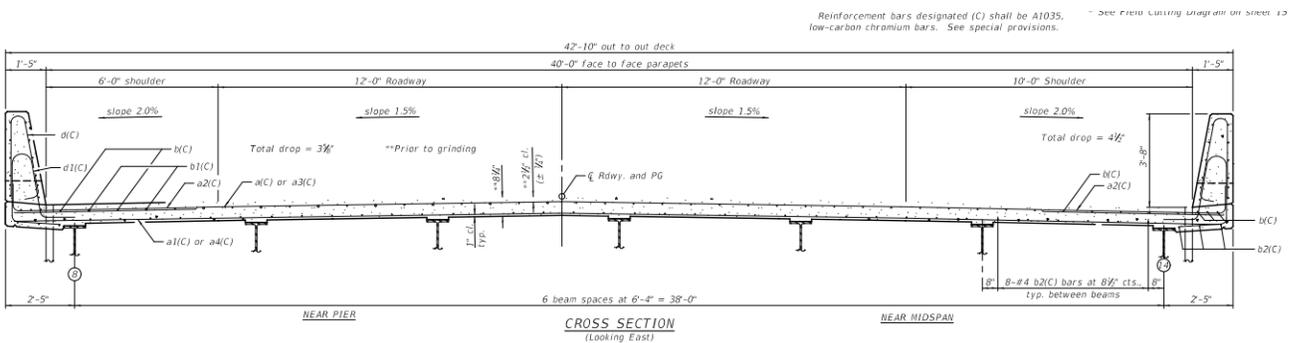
Cross Section of the Effingham Bridge Deck which uses Epoxy bars in WB Bridge and A1035 bars in EB Bridge
